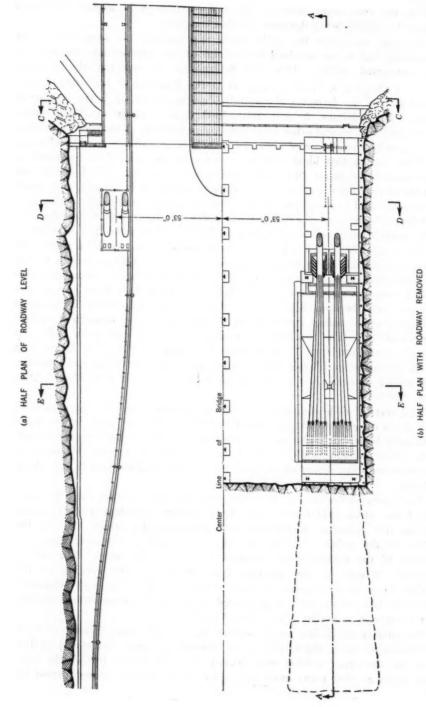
Plan of New Jersey Anchorage (See, also, Figs. 8 and 9).
